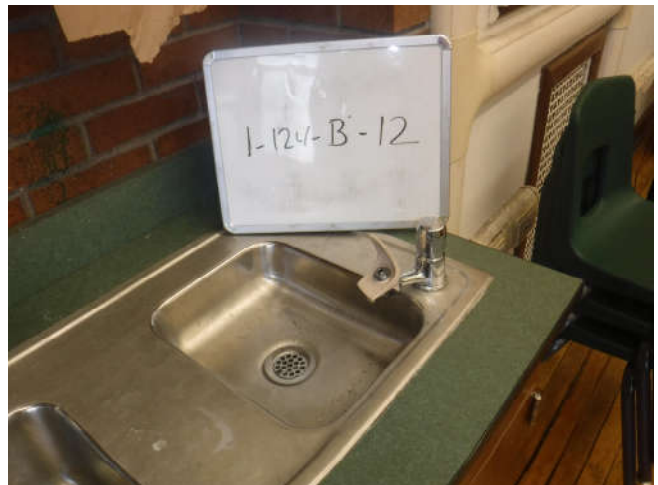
Bubbler, located on the 1st floor, in (K) close to door #10
